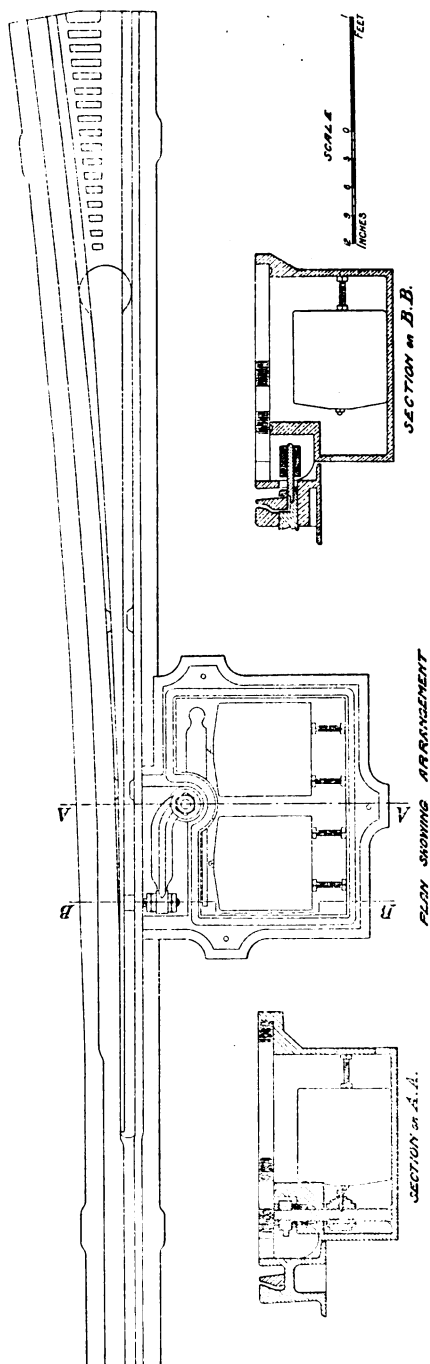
Plan of the Point with the Street Box containing the Solenoids attached, also sections through same.
